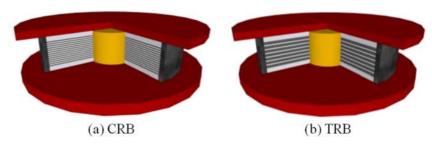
Comparison of conventional rubber bearings and thick rubber bearings.
